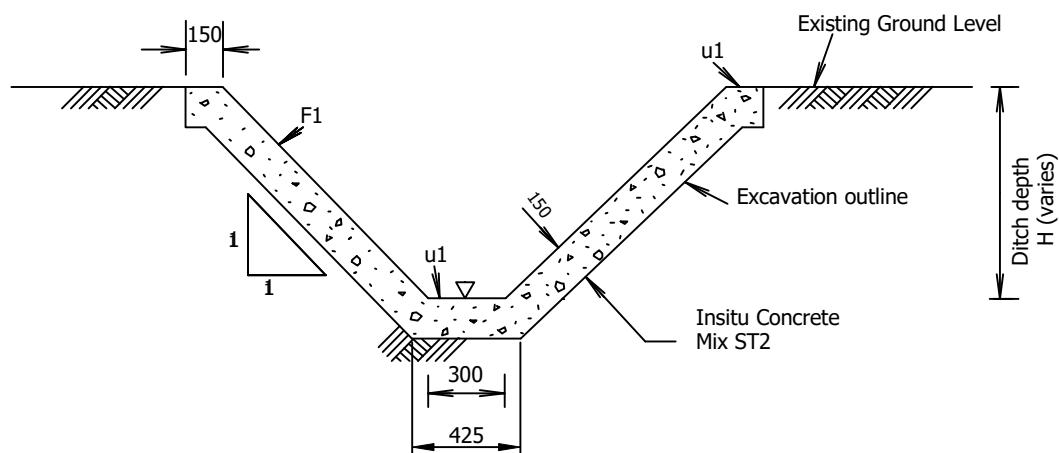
TYPICAL DITCH WITH LINING OF INVERT & SIDE SLOPES WITH IN - SITU CONCRETE
